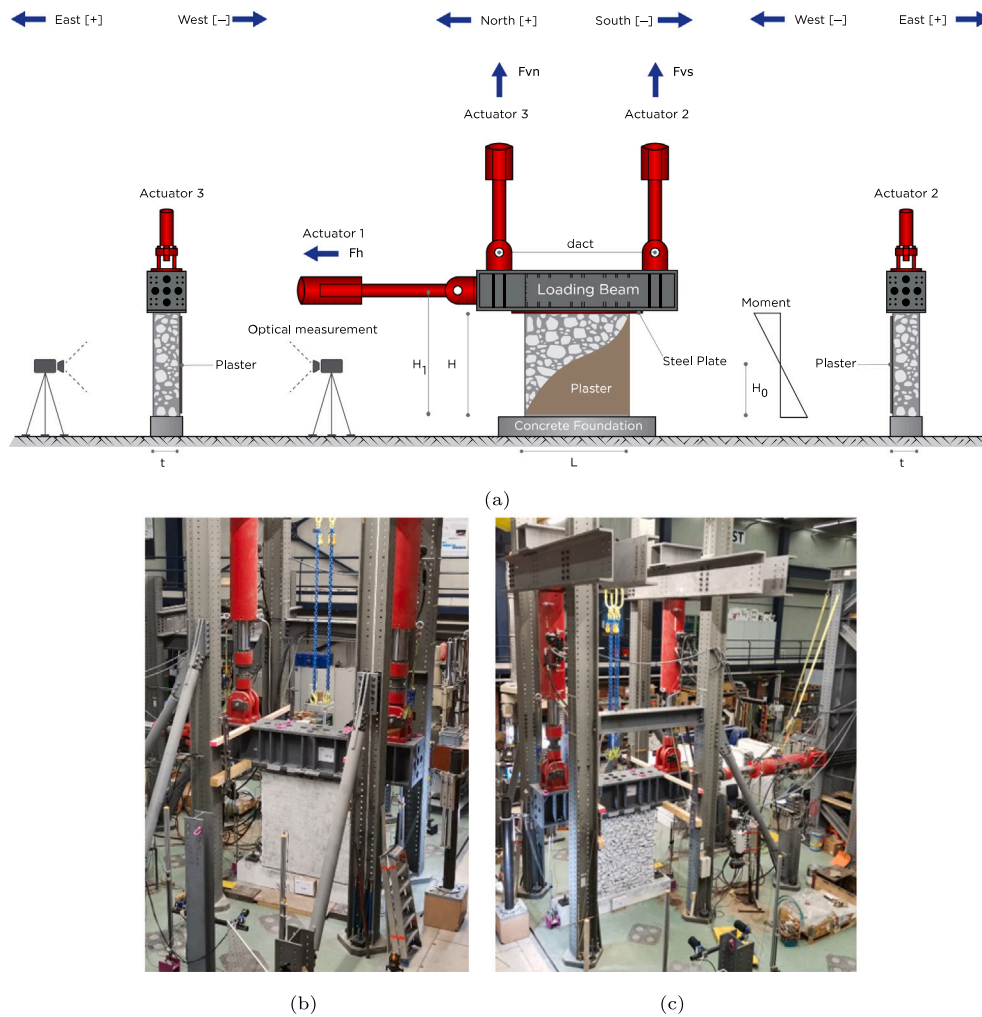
(a) Sketch of the test setup used for the cyclic shear–compression tests on six full-scale rubble stone masonry walls conducted by Rezaie et al. [41]; (b) view of the plastered side; (c) stone masonry side.
